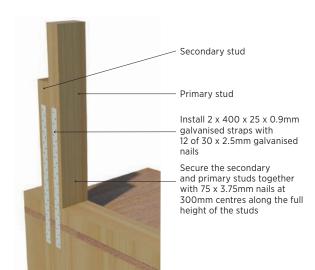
TOP PLATE CONNECTIONS IN BRACING ELEMENTS
